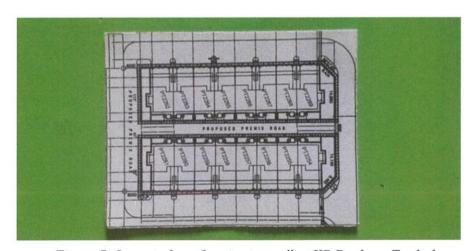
Layout plan of perimeter wall at KP Perdana Tambahan
